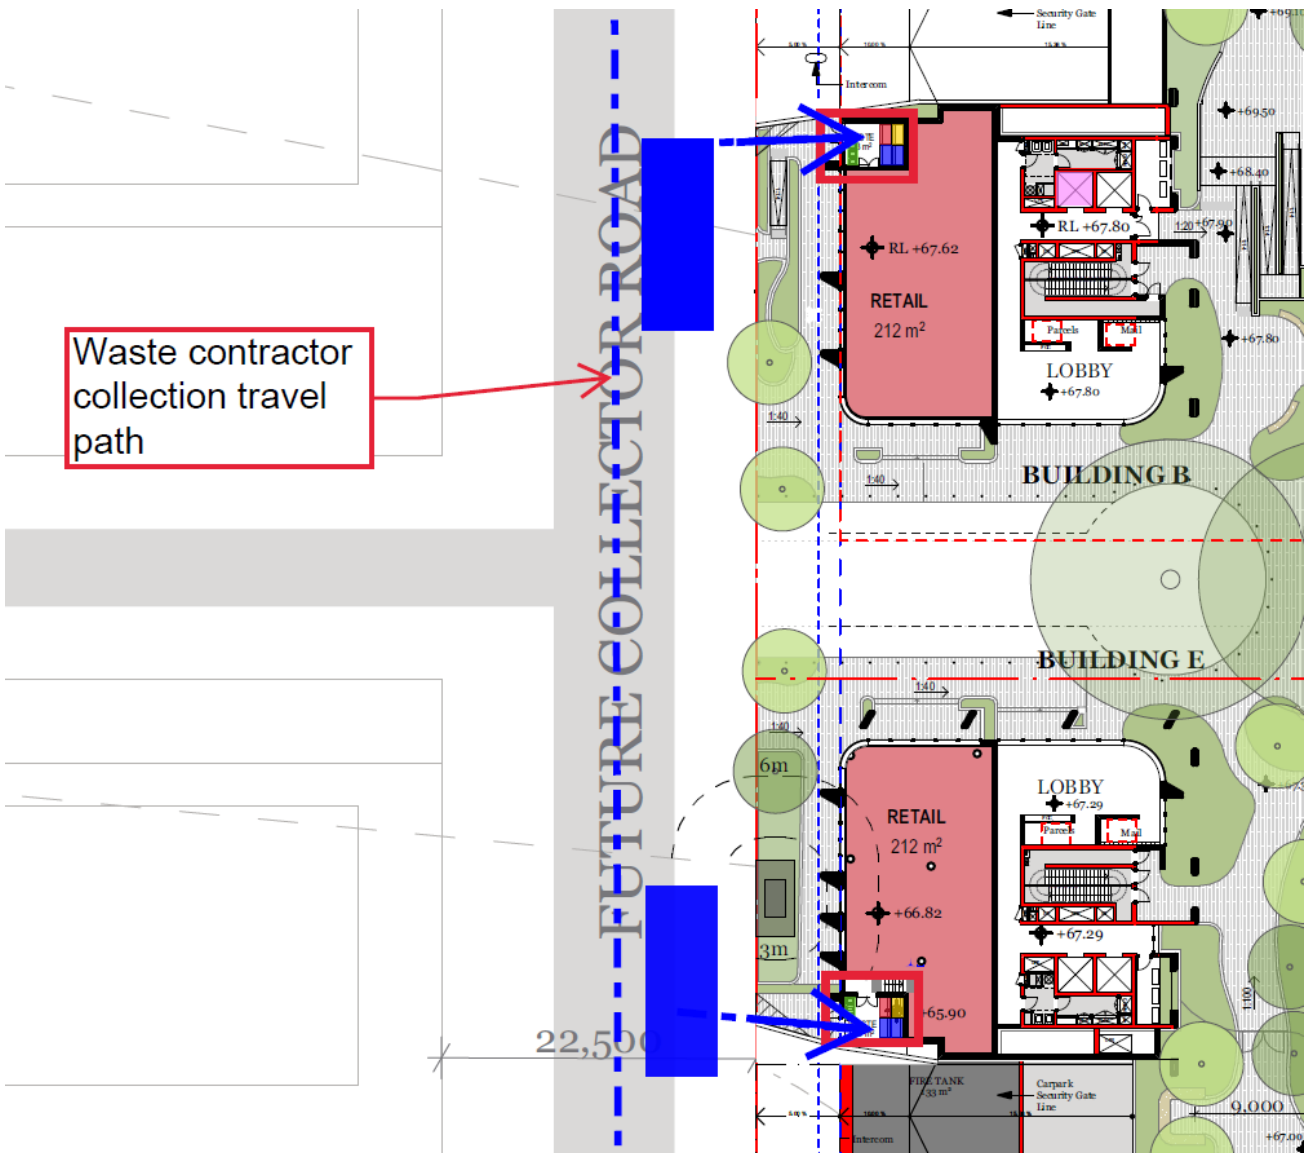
Retail waste travel path Lower Ground Level (B2 waste storage room) - Stage 1
